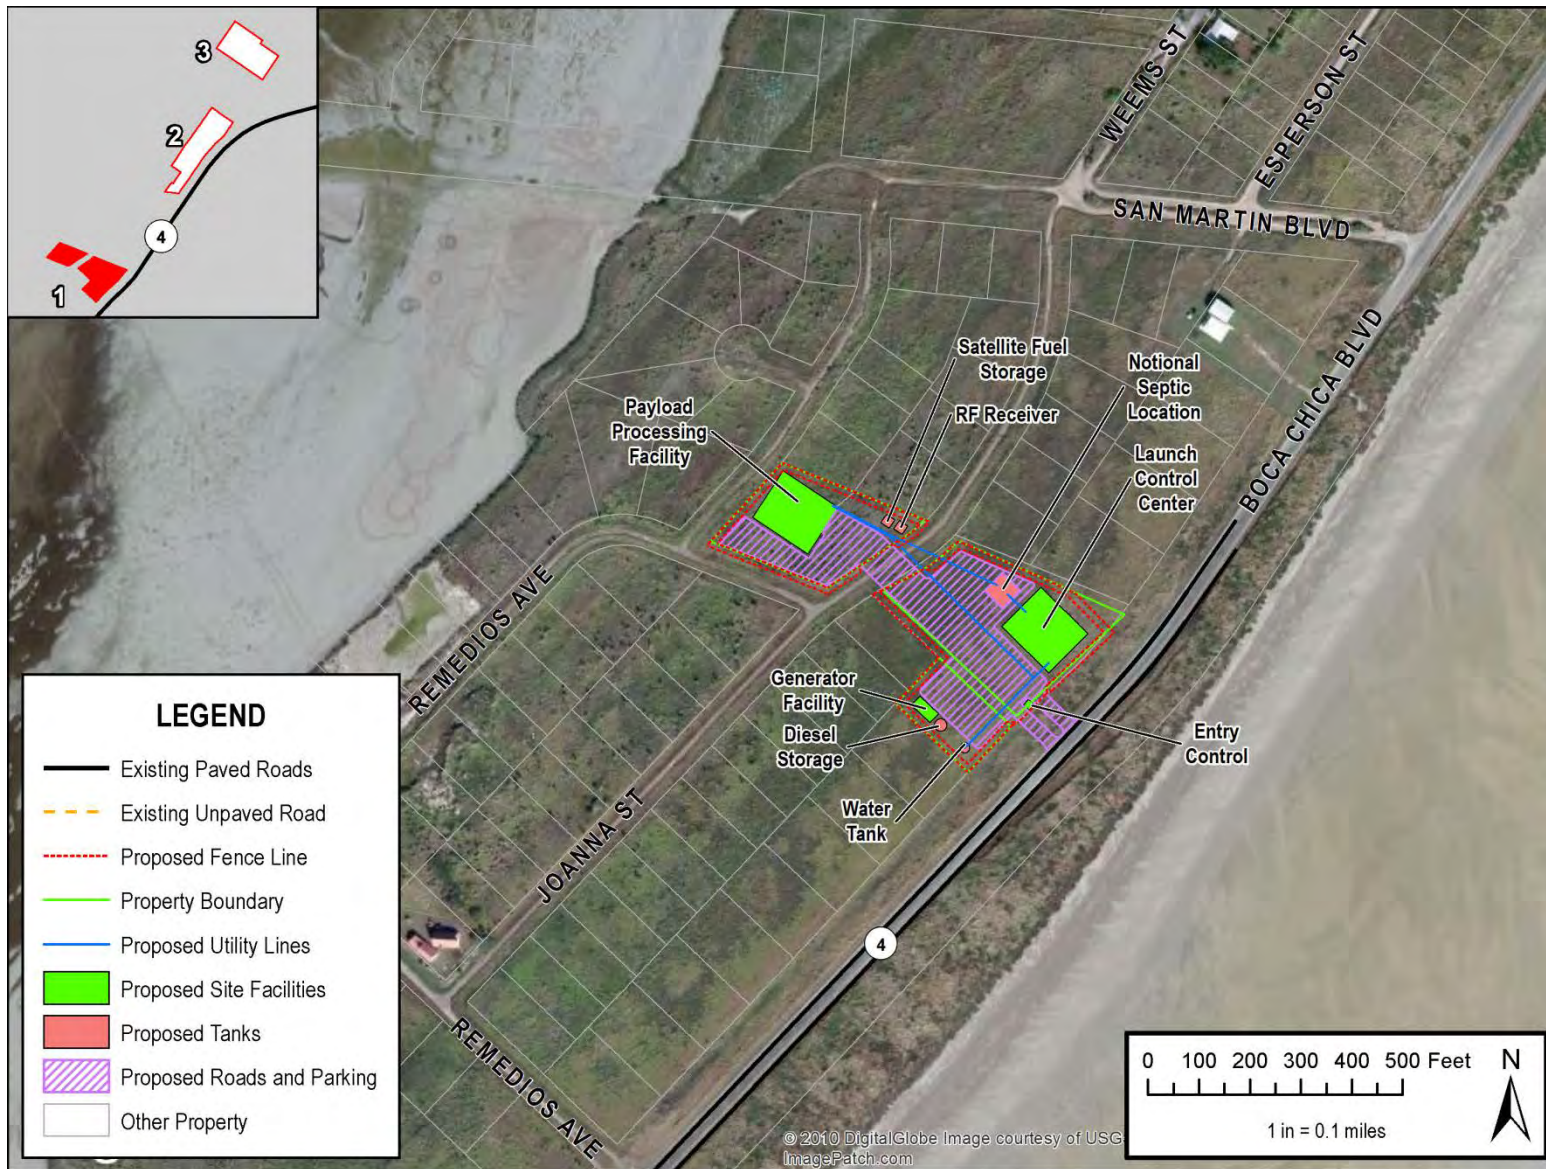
Control Center Area Site Layout – Parcel 1
